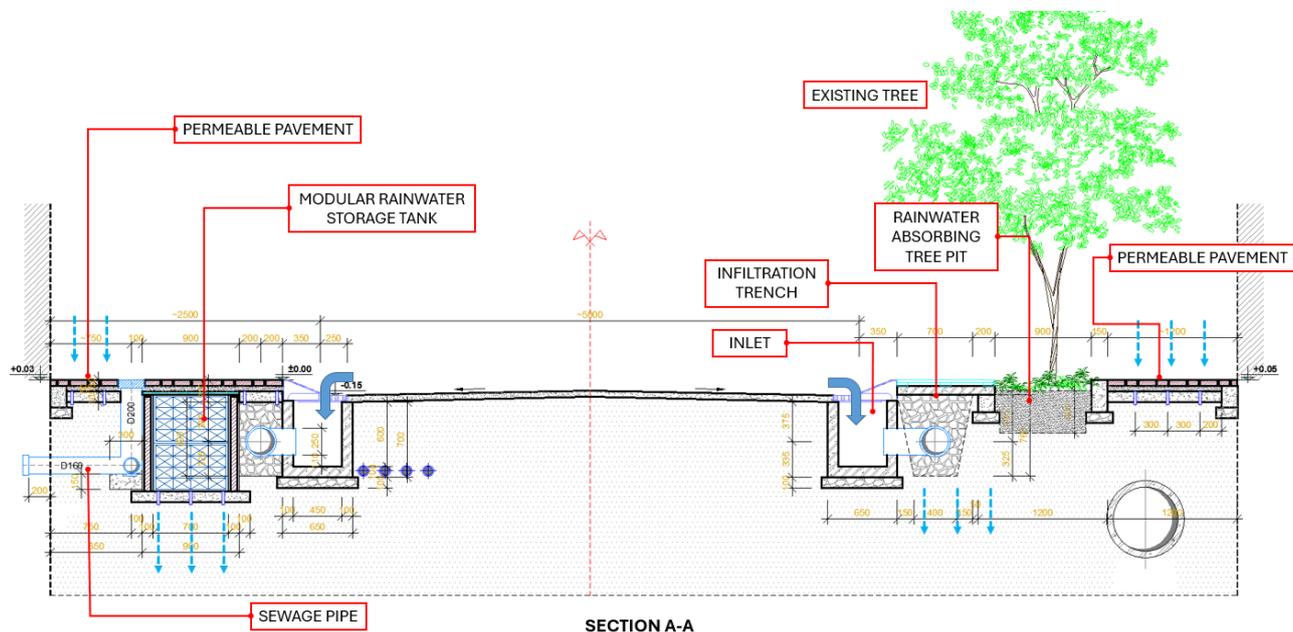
SUDS pilot project in Phan Boi Chau Street –Concept design with option 2
